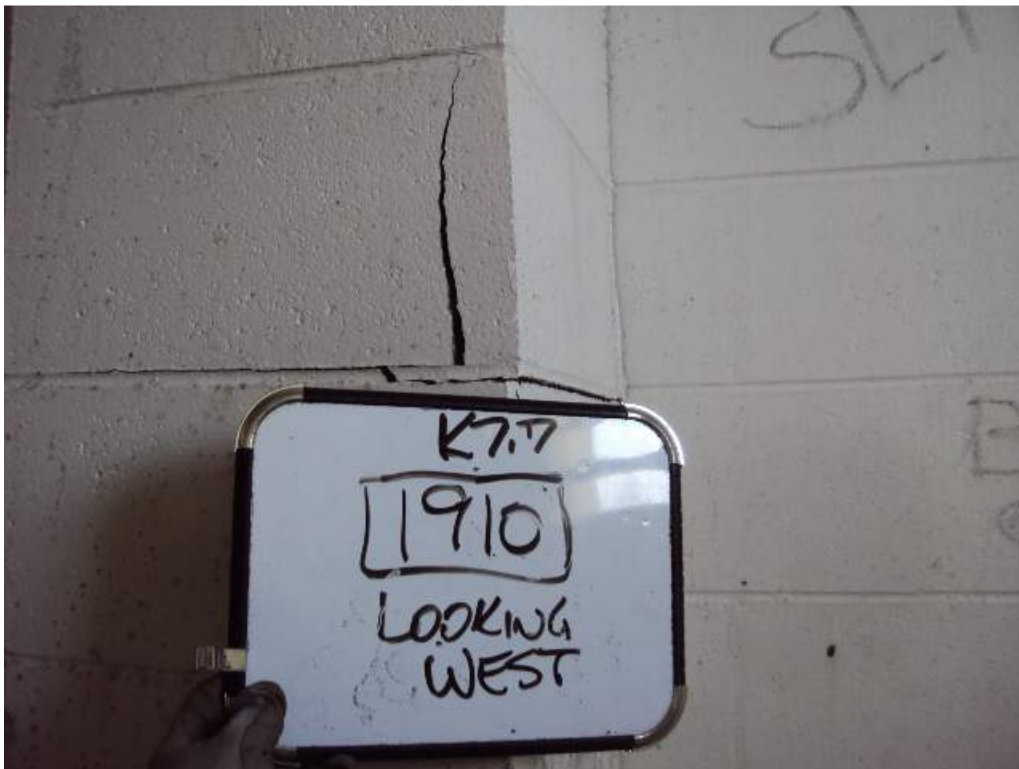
1st Floor –Room 1910 – At col line K.7 and 7 – Looking West– Vertical and horizontal cracks CMU wall
